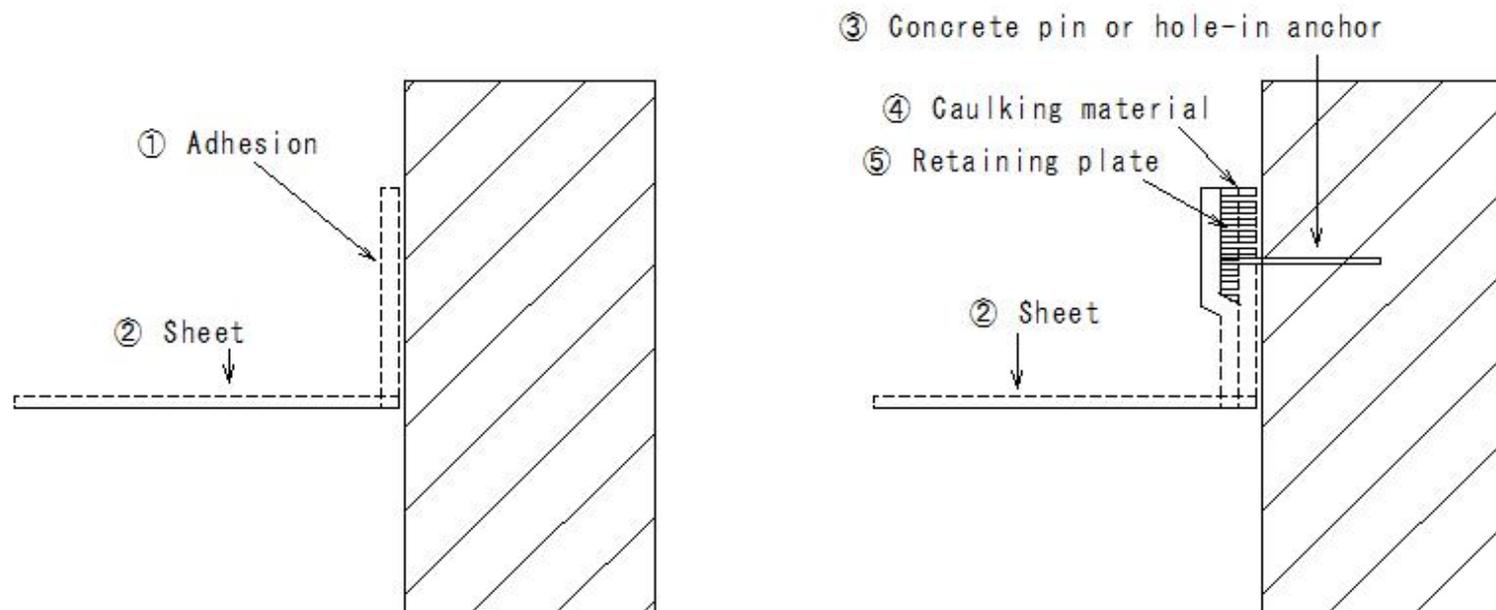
How to attach the sheet to an existing concrete structure
